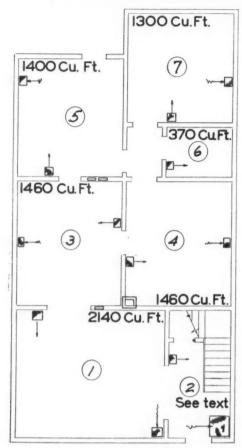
First floor plan showing inside wall registers and outside wall returns
